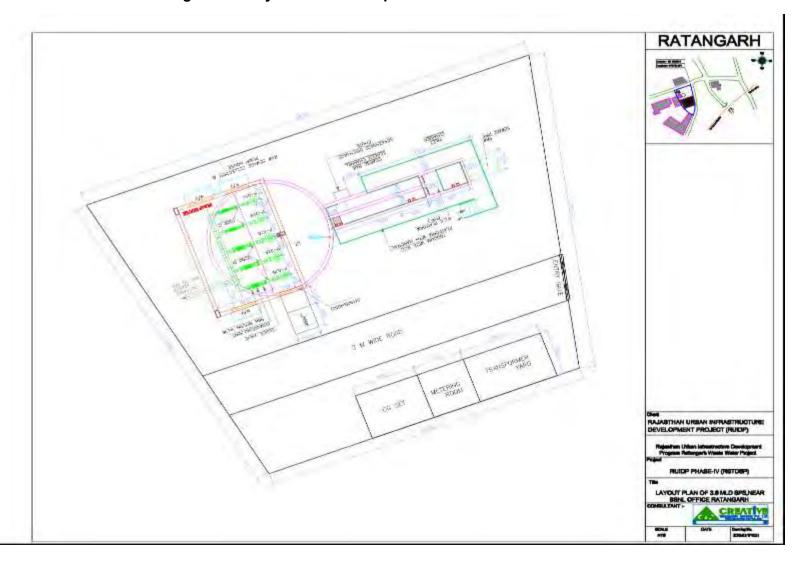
Layout Plan for Proposed SPS 1 near BSNL Office
